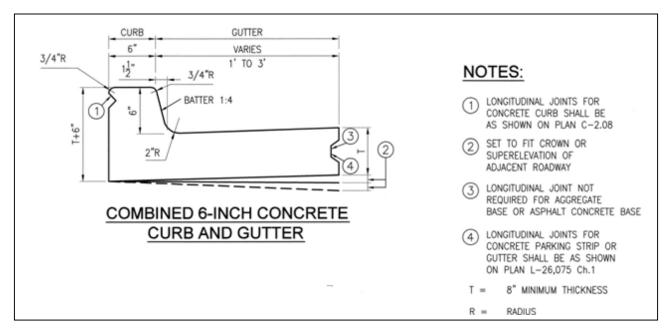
Standard curb and gutter detail; downloaded from the Department of Public Works website.
